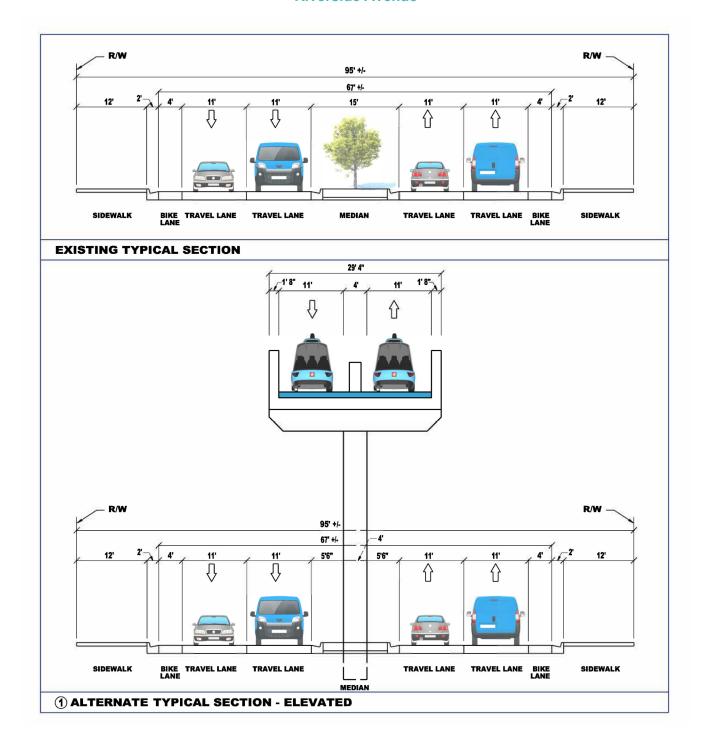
West Corridor Existing and Alternate Elevated Typical Section - W. Riverside Avenue
